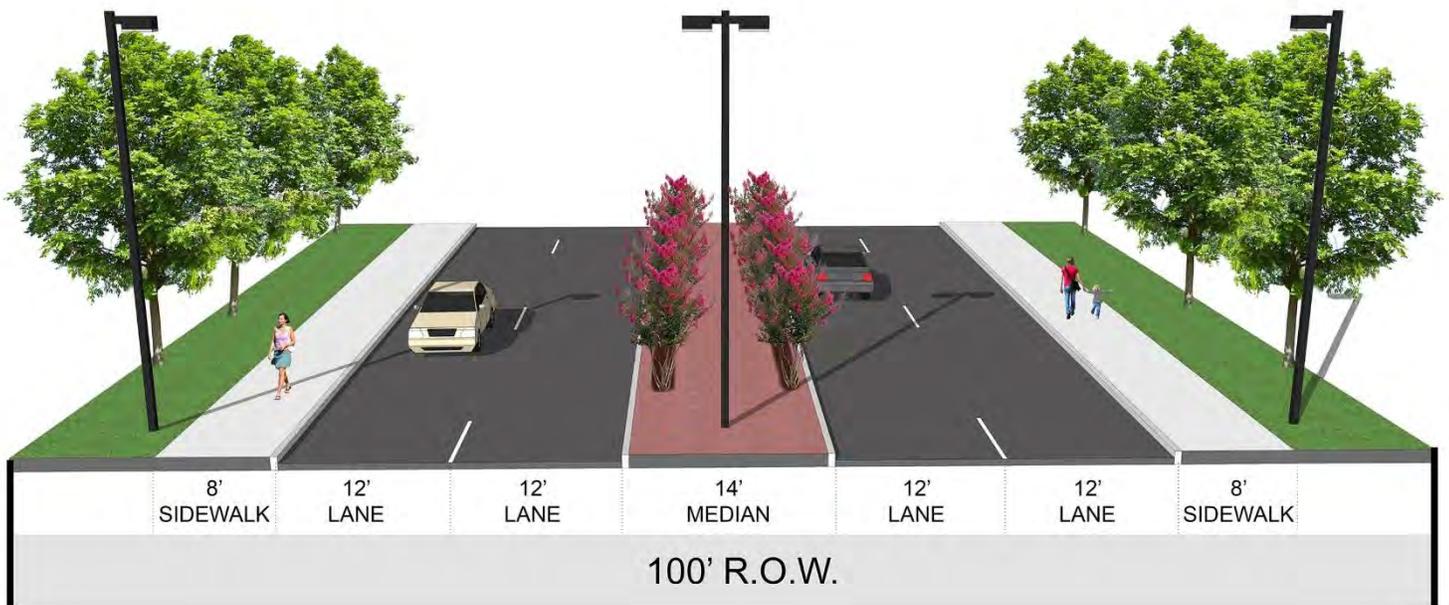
Approach Street – Four-Lane Urban Section Divided - Historic Core
